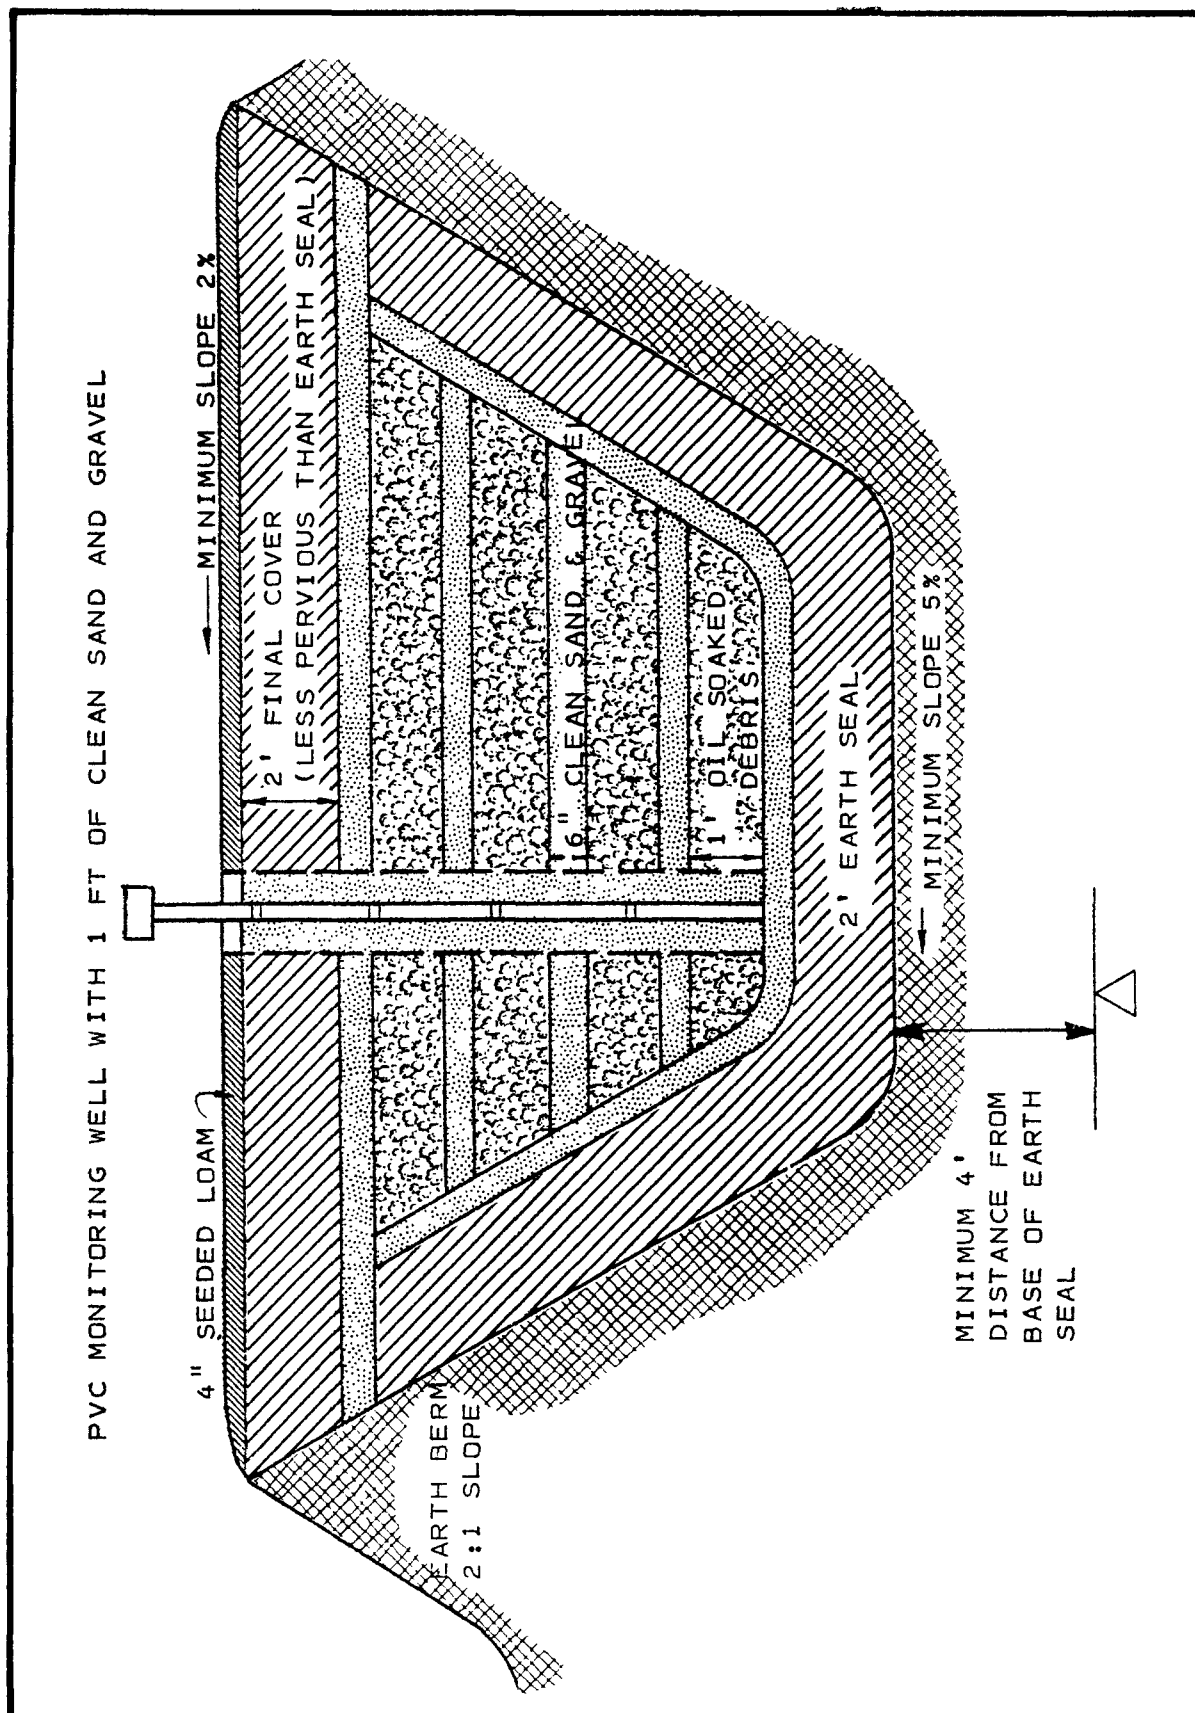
SECTION VIEW OF EPA DEBRIS DISPOSAL PLAN -
